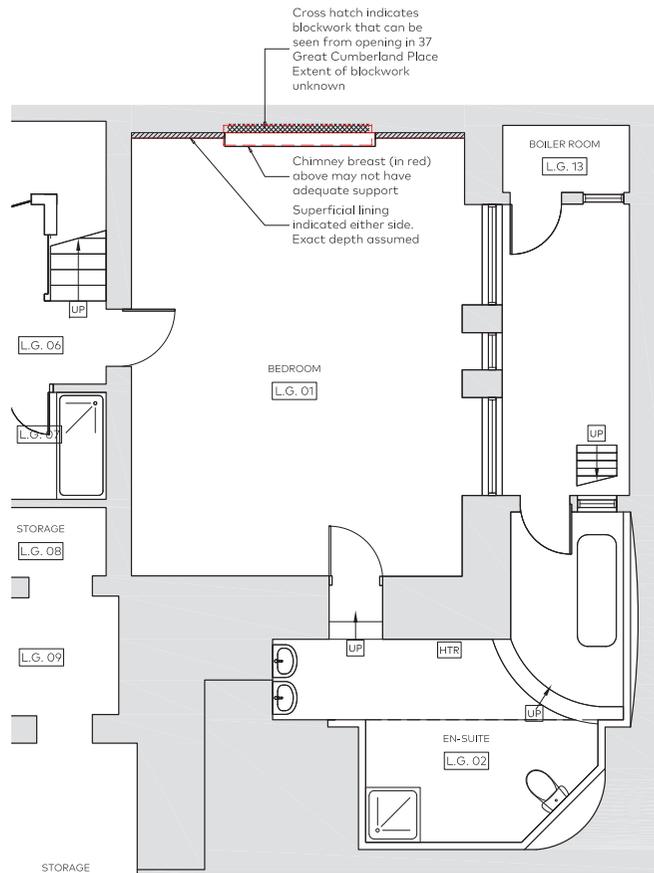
Diagrammatic sketch of current arrangement at Lower Ground Floor
